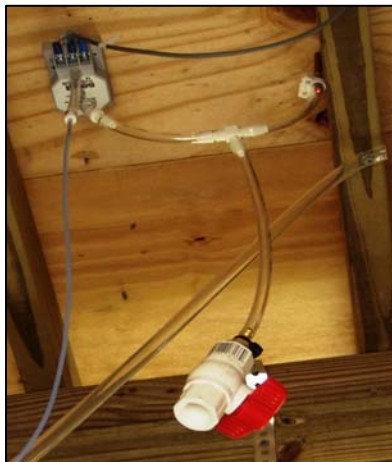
U-Shape Roof Port Connection for Prevention of Water Damage
